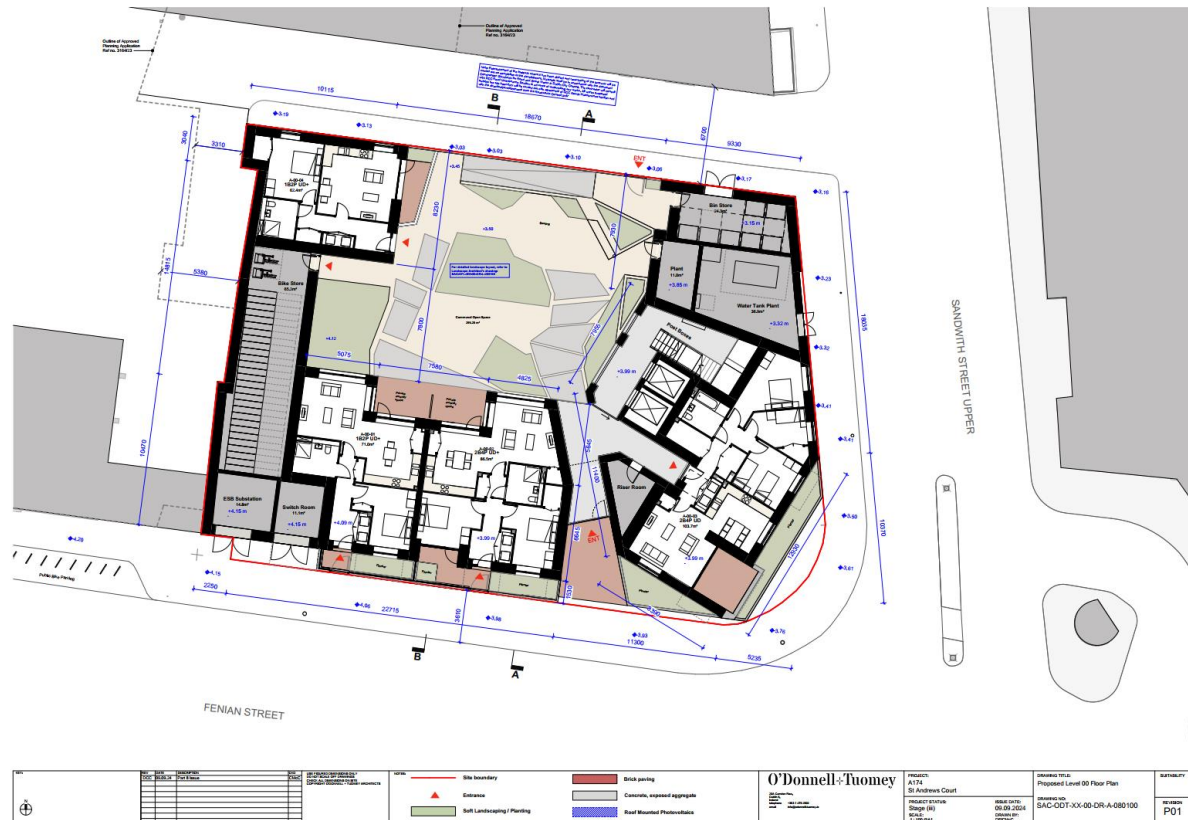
Proposed Development Layout- Ground Floor (O'Donnell Tuomey)
